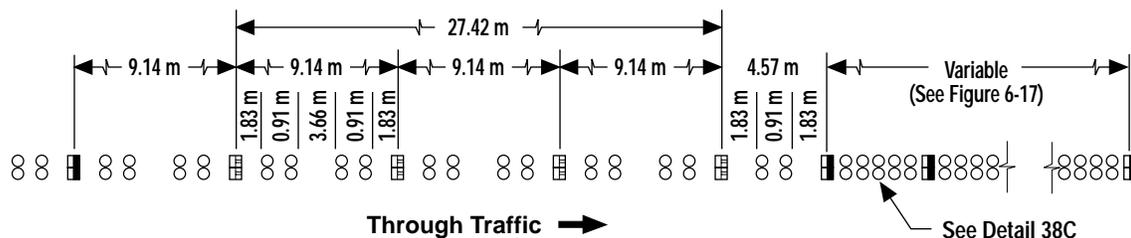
B - Lane Drop Markings at Conventional Highway Intersections
